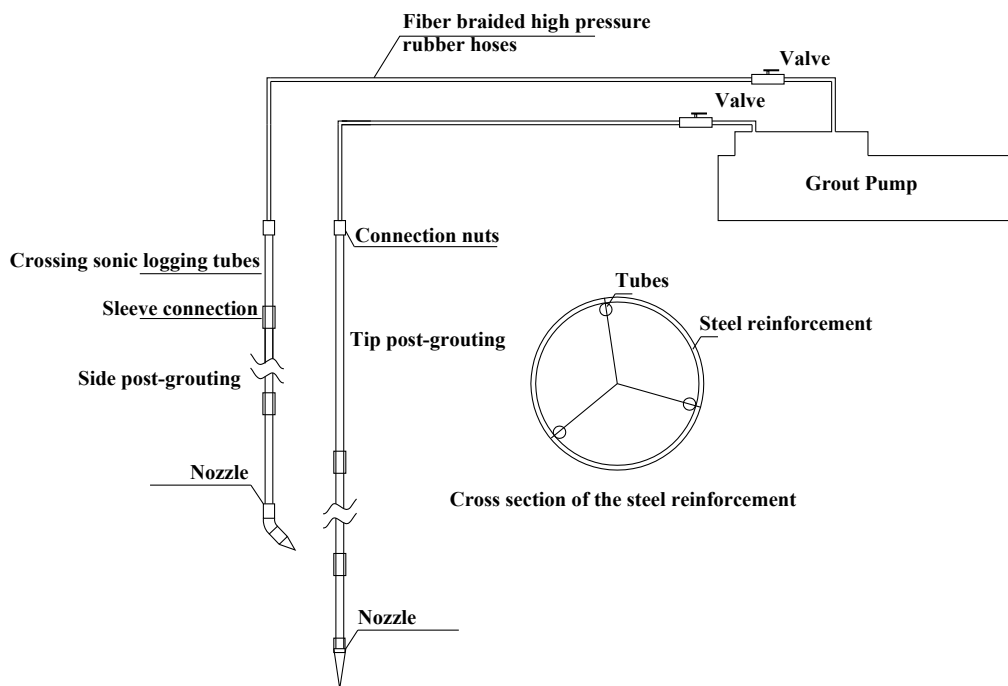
Post-grouting system (side post-grouting and tip post-grouting)
